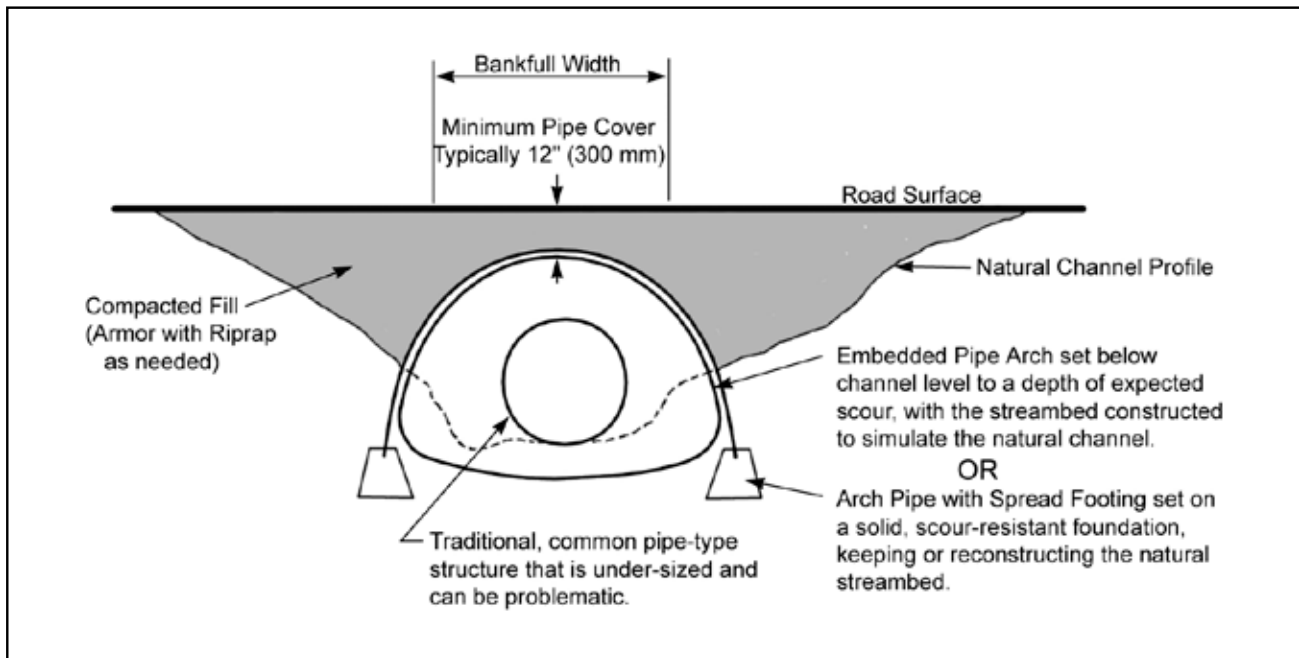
An improved or stream simulation culvert installation compared to many traditional culvert installations.
